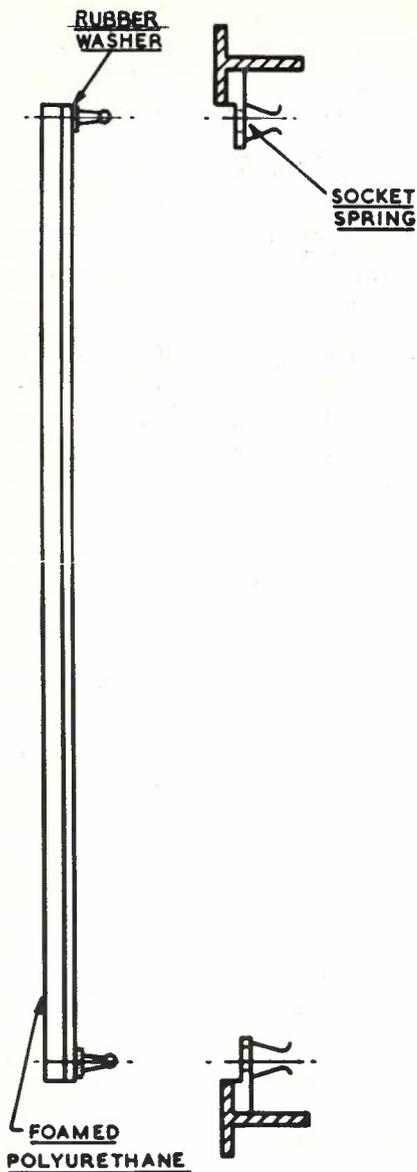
Jacked-in centre support for making dust seal with inner edges of removable P.V.C. panels.
